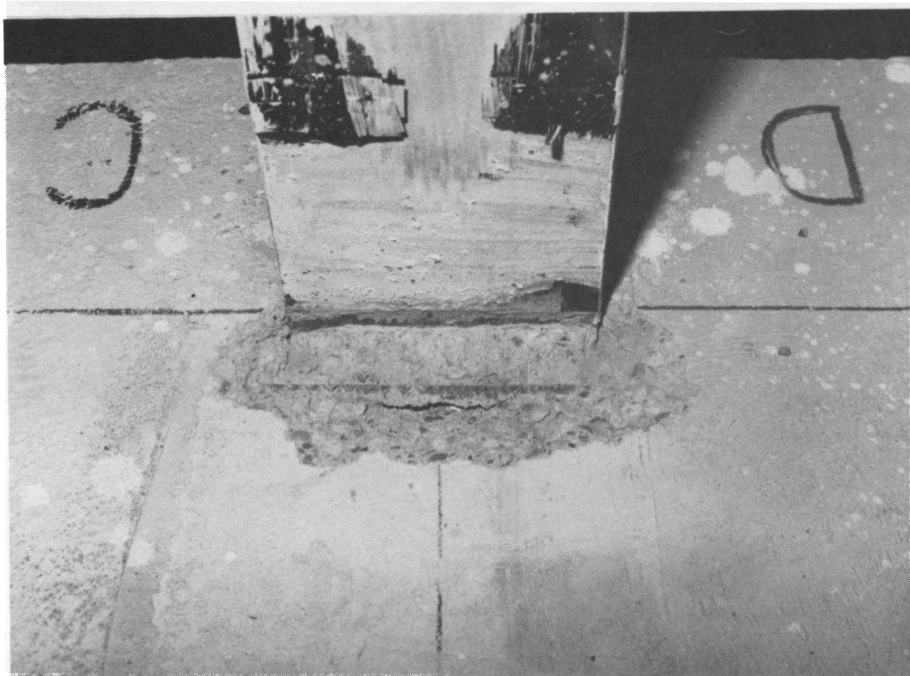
Failure Surface on Leeward Side of West Column of CA-2
